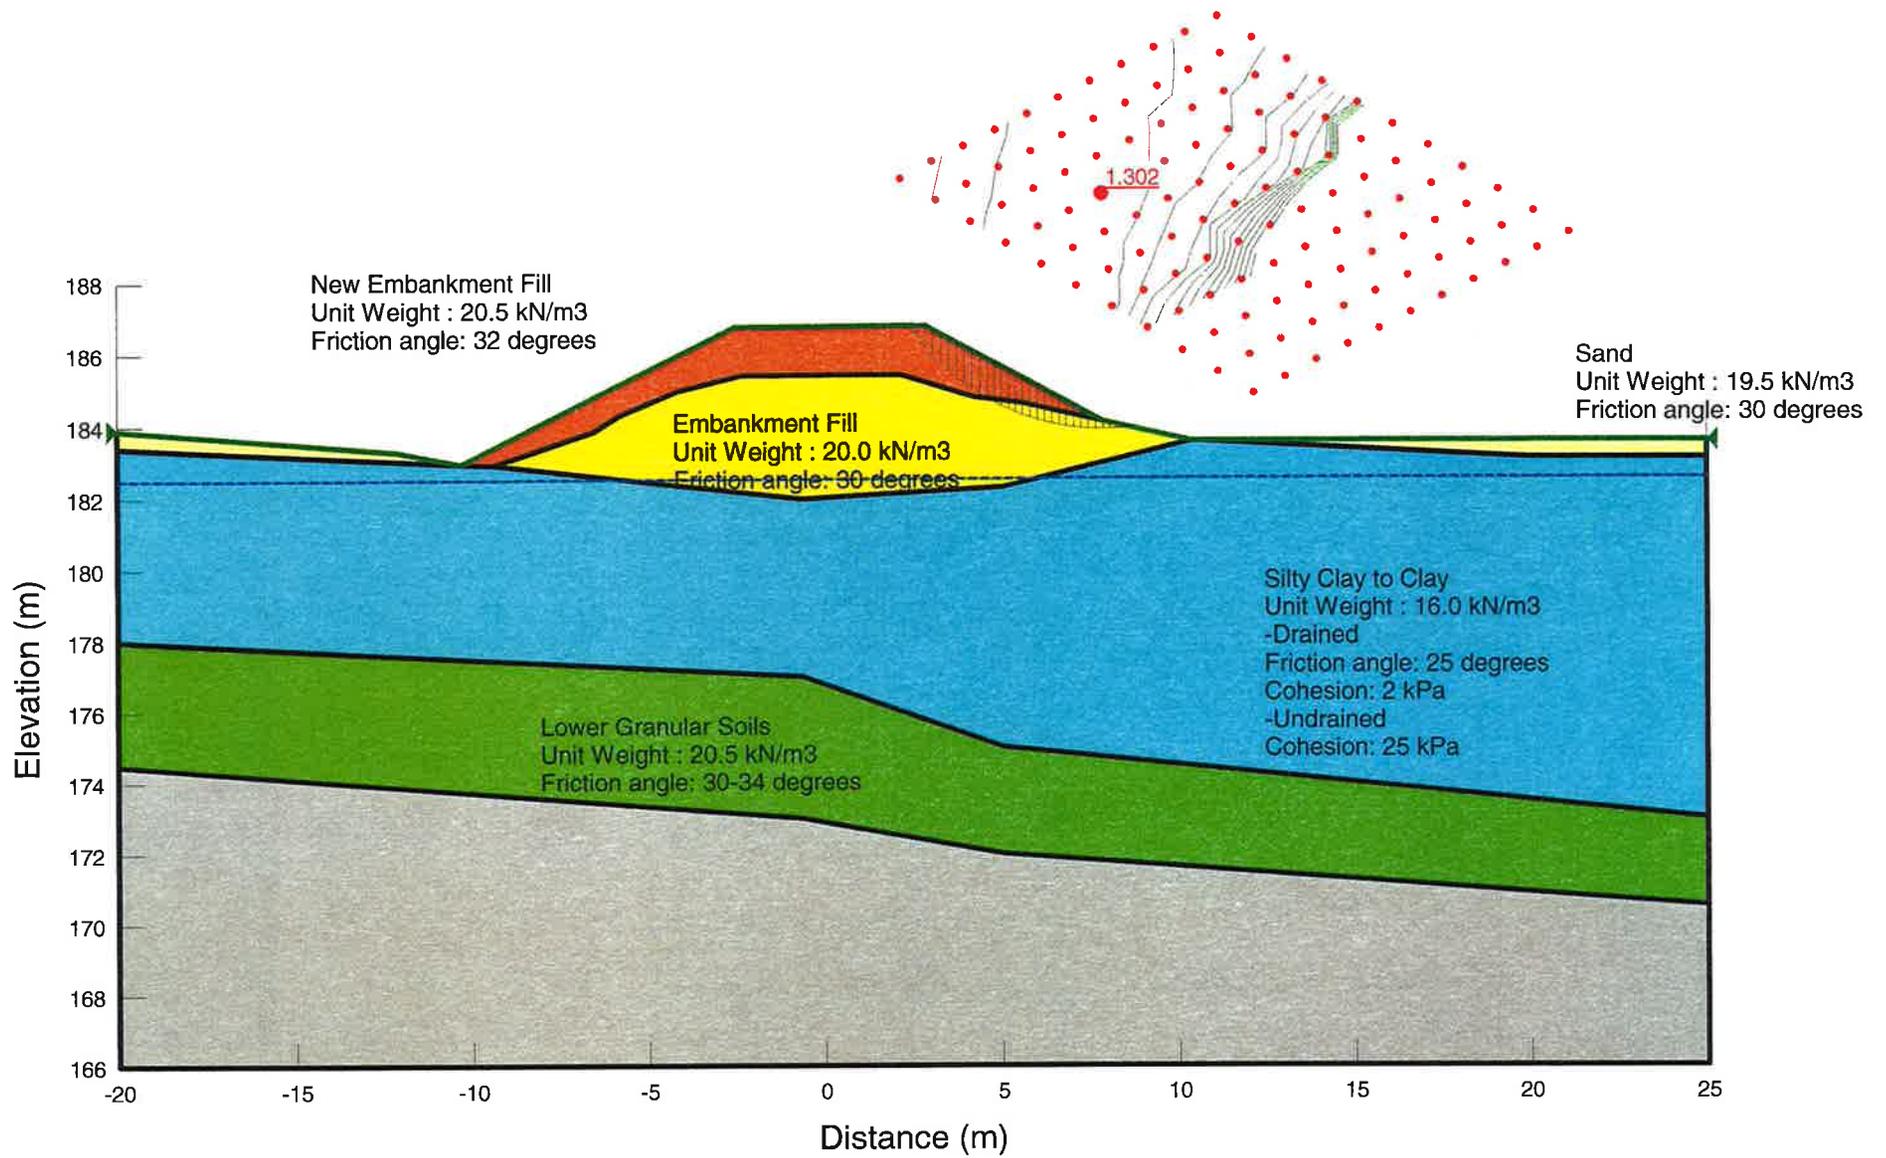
Stability analysis @ STA 10+210 with 0.8 m surcharge (south abutment location) for concrete bridge option
